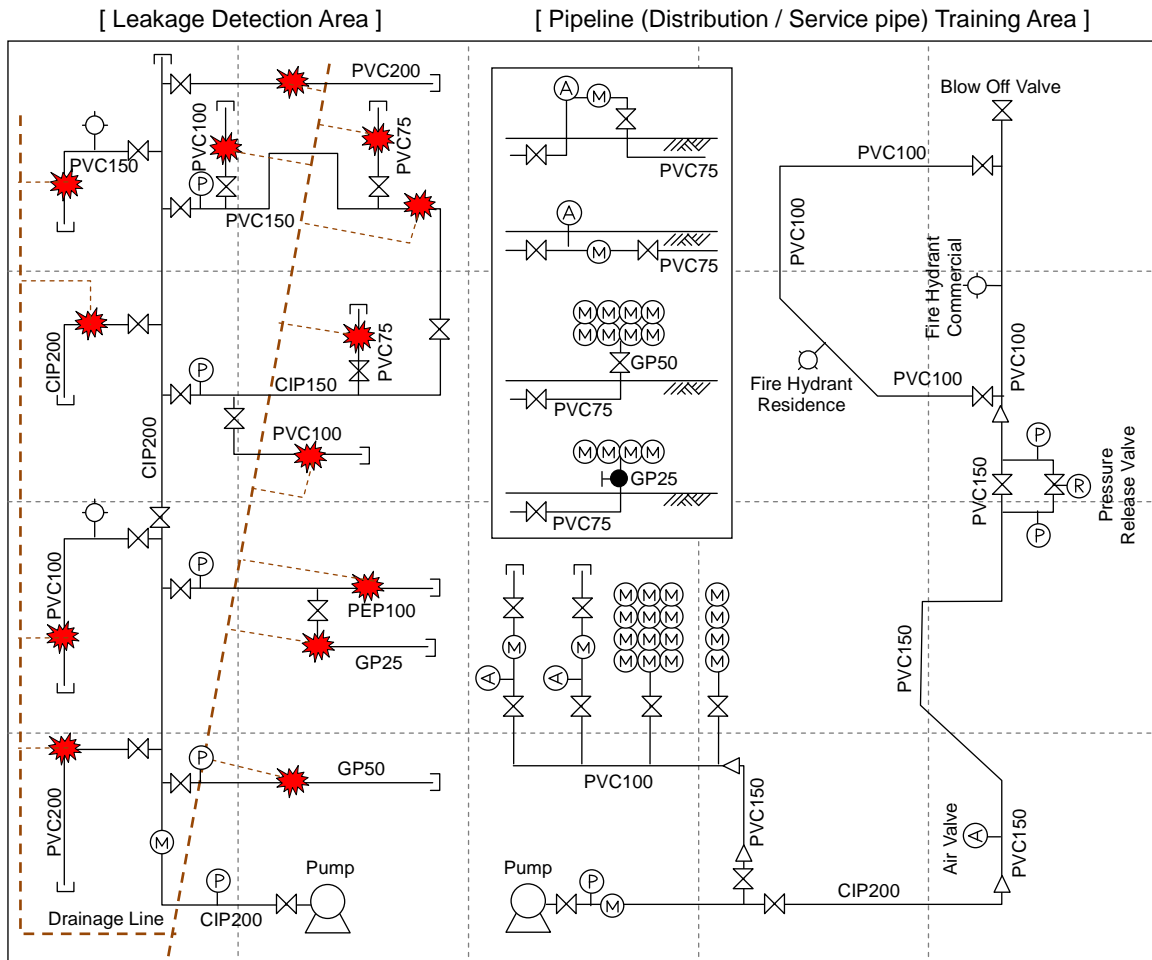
Simple Design of Pipeline Training Facilities
